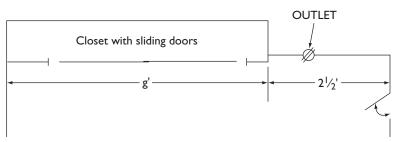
Receptacle requirements on a wall containing a closet with sliding doors.
